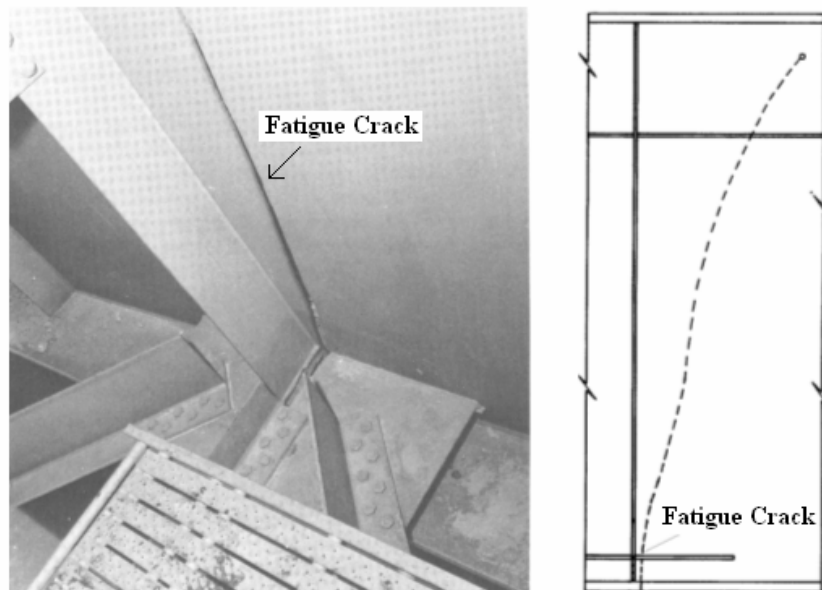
Fatigue Crack in the Gusset Plate-Transverse Stiffener Detail (Fisher, 1984).
